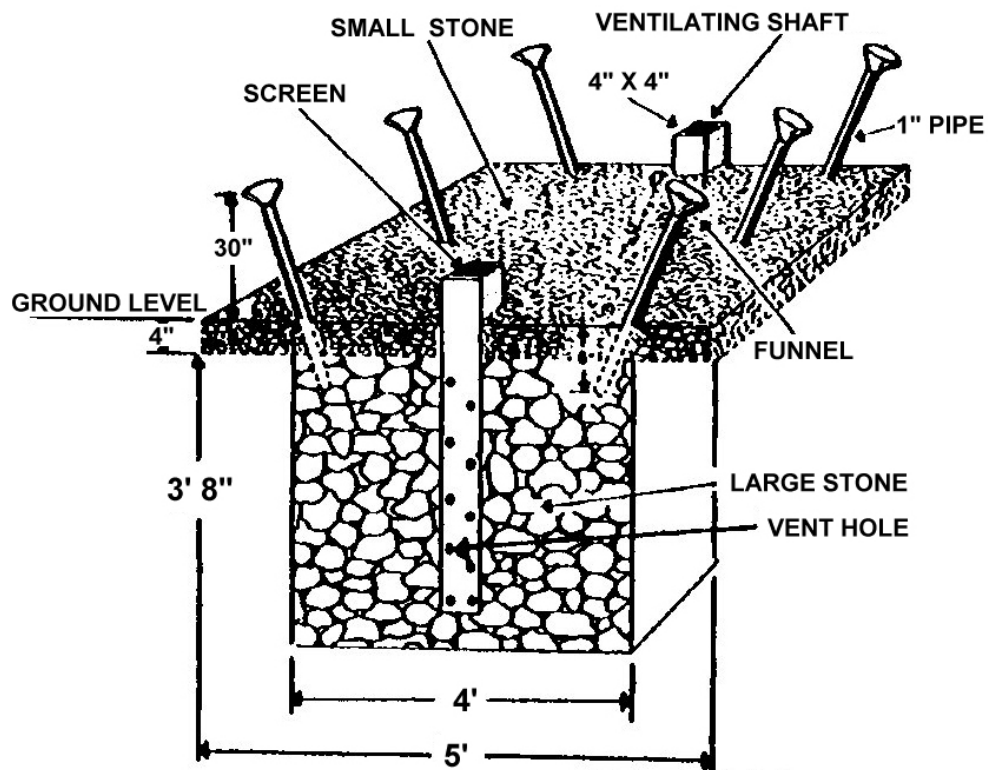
Urine soakage pit with pipe urinal arrangement.
